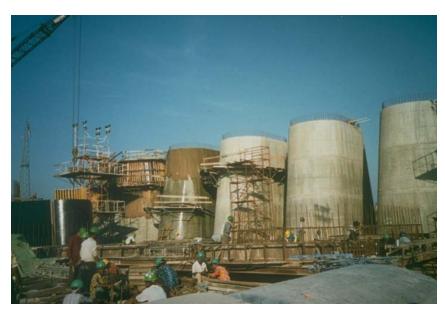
Precast Pile Cap Shells (Jamuna River Bridge)
